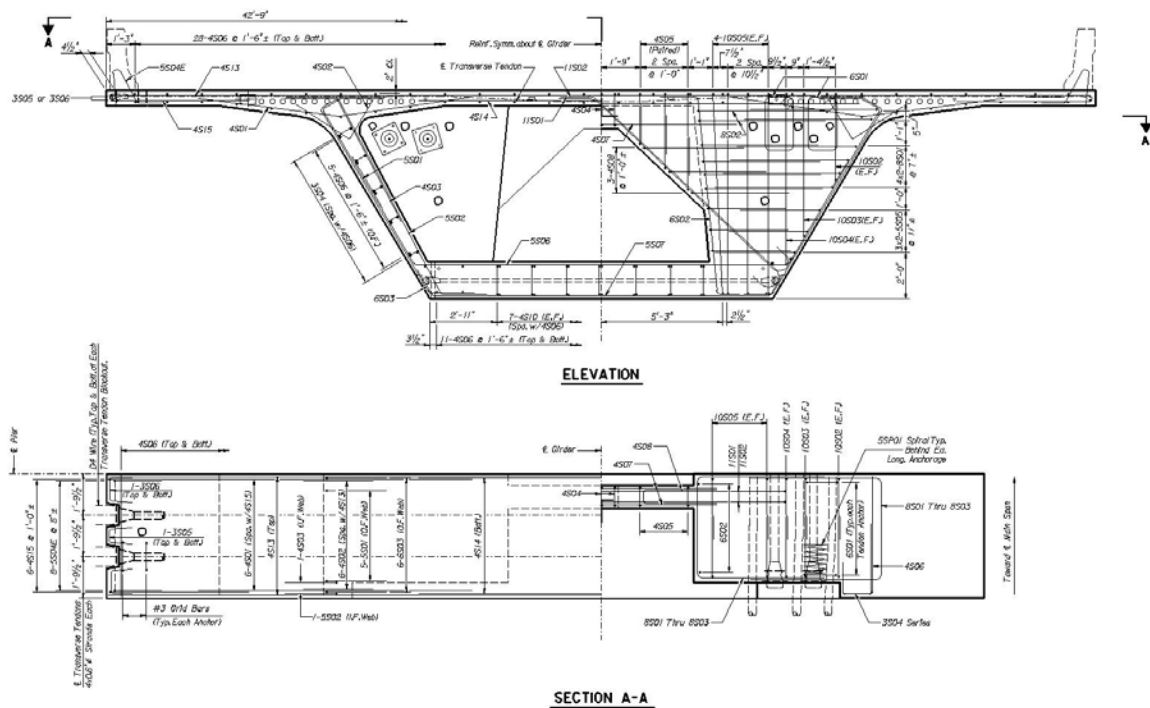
Choctawhatchee Main Span Pier Segment Reinforcing (FIGG)
